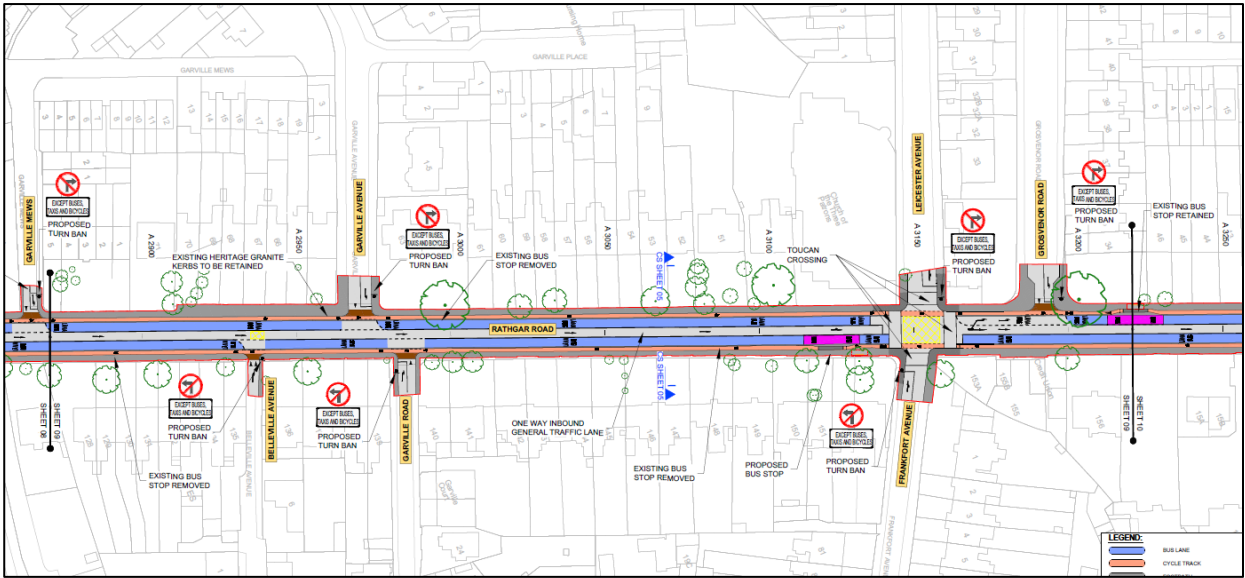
Extract from General Arrangement Drawings (Sheet 9)
